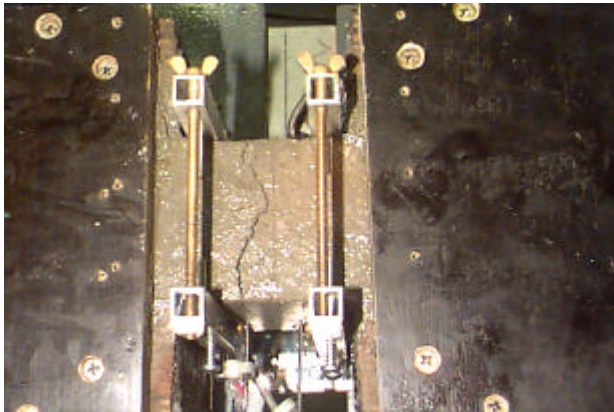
Plan view of tensile test specimen, showing mould, semi-elliptical transitions and removable side panels A.
